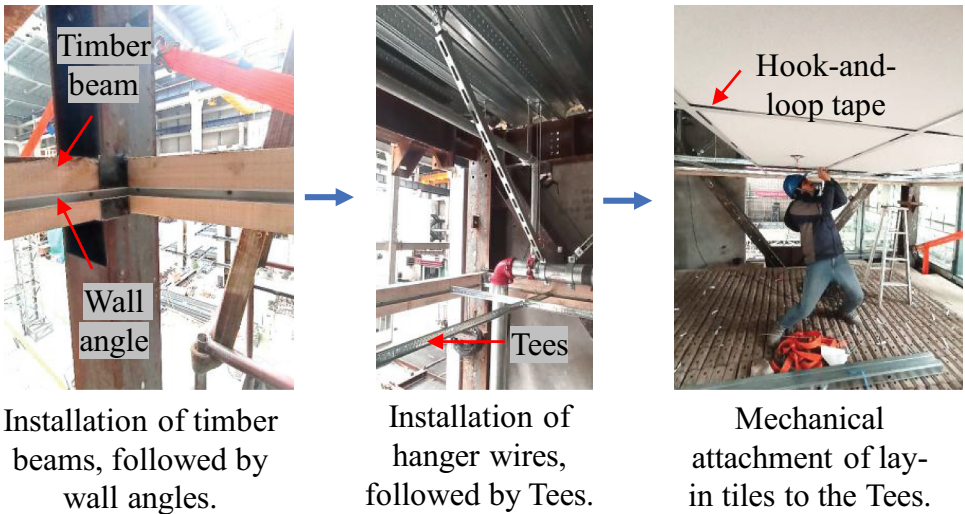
Photographs illustrating the installation of the perimeter-fixed ceiling system.
